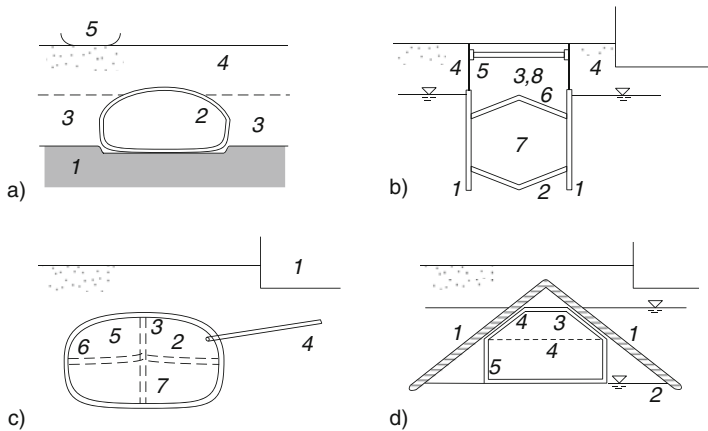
Design scenarios for tunnels in psammoid ground: shell with overburden (a), walls with roof and invert (b), section-wise mining (c), mining with grouted or frozen roof (d). Numbers denote the succession
